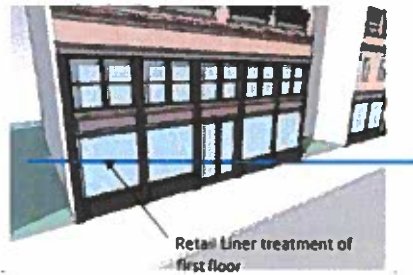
I: Ground-Floor Design, Liner Building
